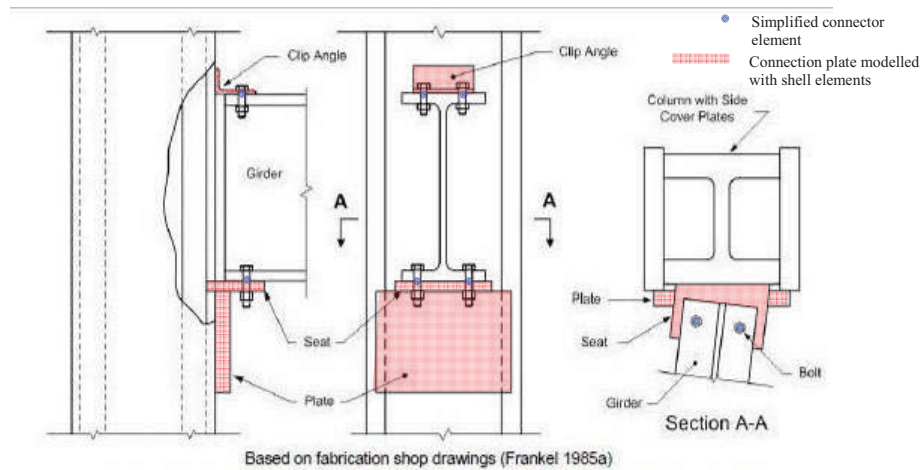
Schematic drawing of the seated connection at Column 79 identifying where shells and simplified connection elements will be used
